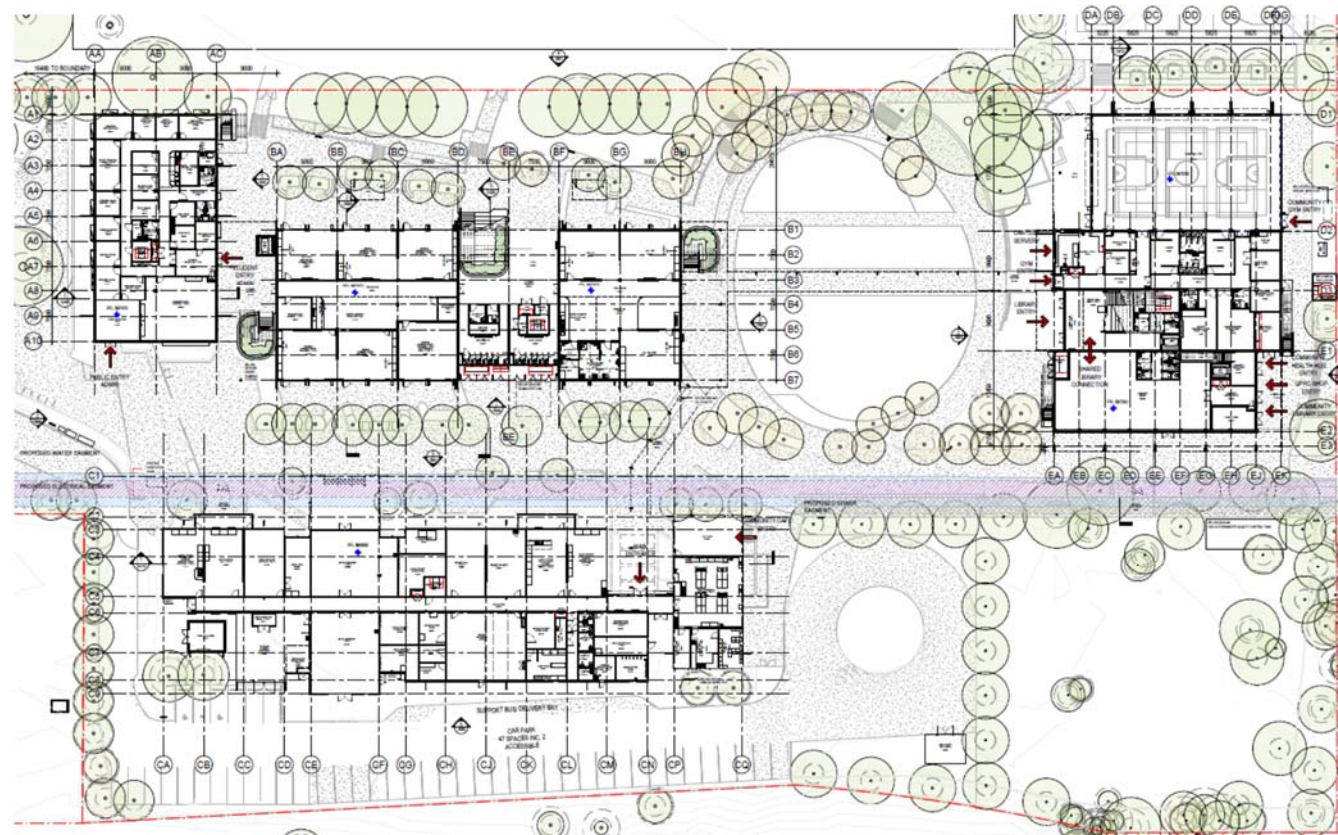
Proposed Architectural Ground Floor Plan for BHS (Source: TKD Architects)
